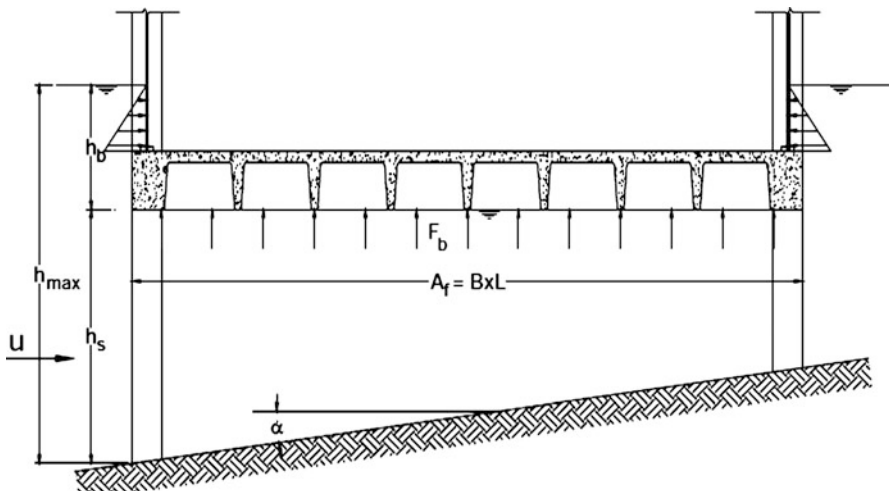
A definition sketch for upward buoyant force exerted on an elevated floor
